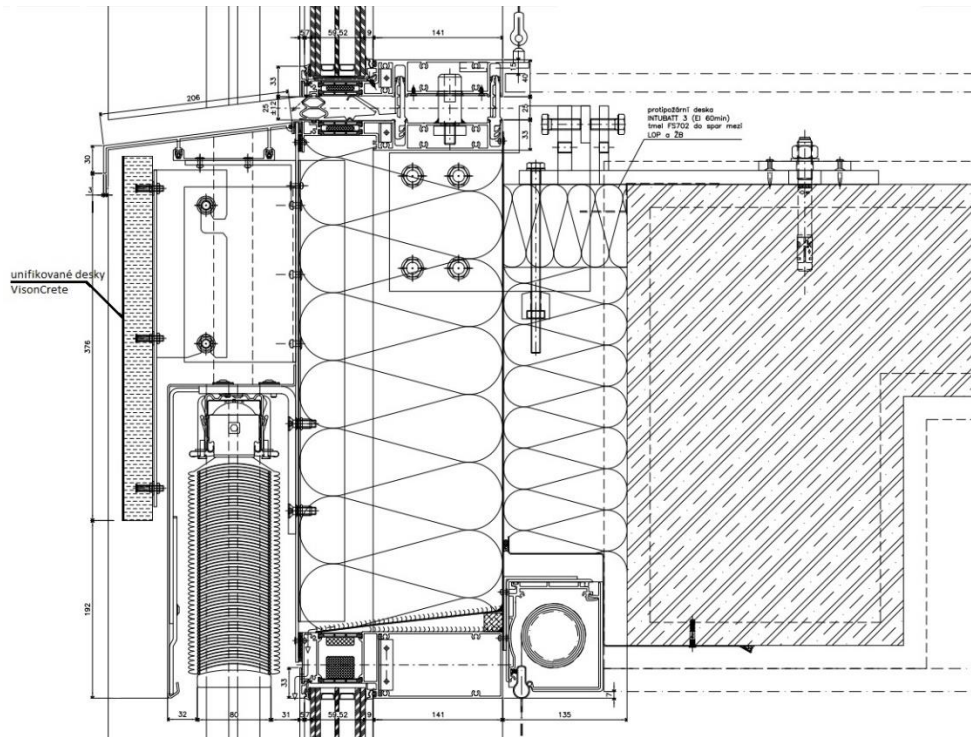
Detail - fixing of the slabs - section in contact with the ceiling slab
